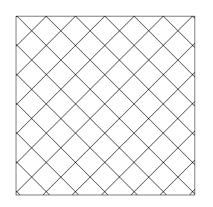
COLUMN CROSS-SECTION BASED ON CRACKING IN CORE C47
